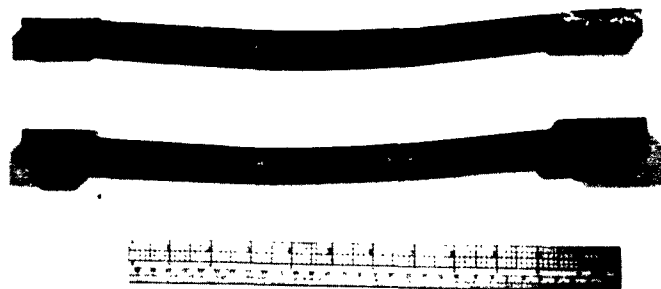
FIXED ENDED MODEL BEAM AFTER FAILURE.
